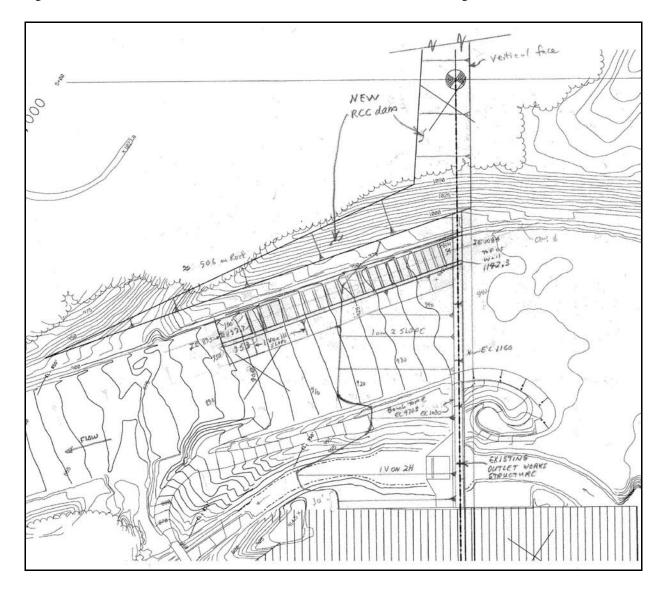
New Outlet Works Location for SRS Raised 160 feet, Configuration 3
